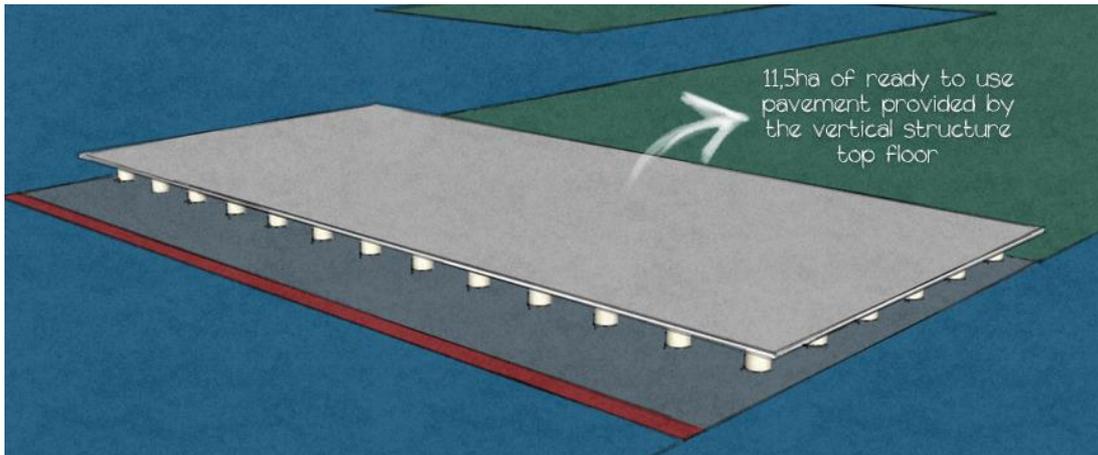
Artist impression of the VPC top level ready to use concrete pavement
